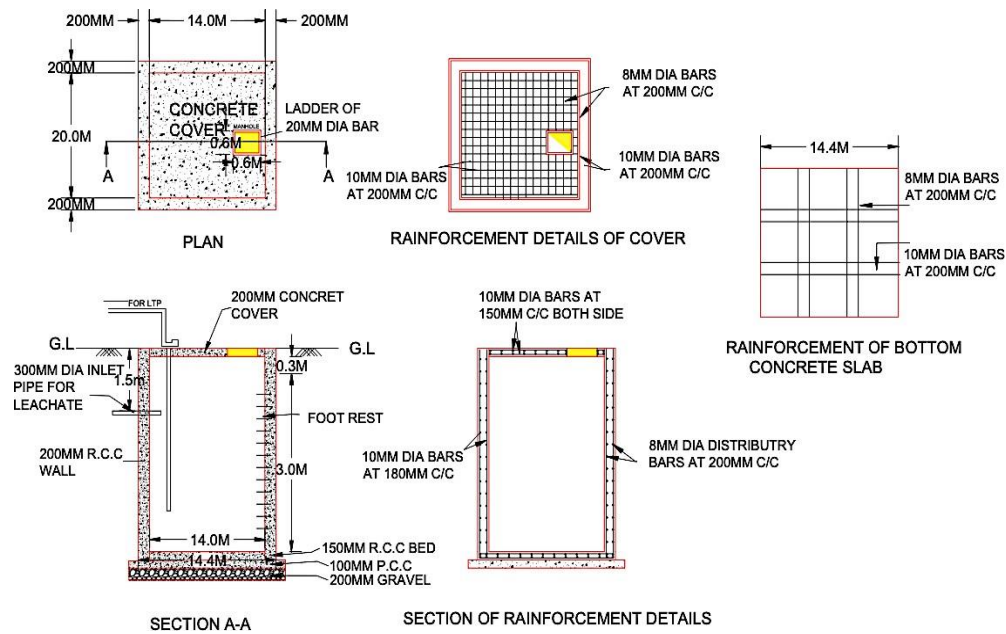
Detailed Layout Plan of Leachate Collection Tank. Notes: All dimensions in meter.
